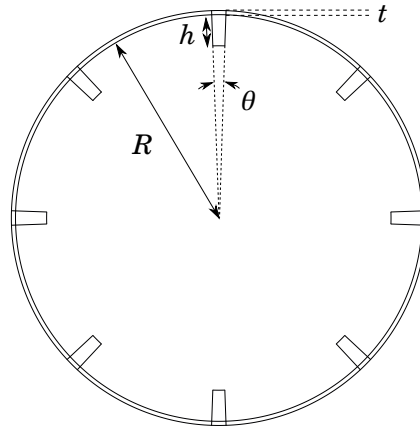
Cross-section view of the geometry and position of the longitudinal stiffeners.
